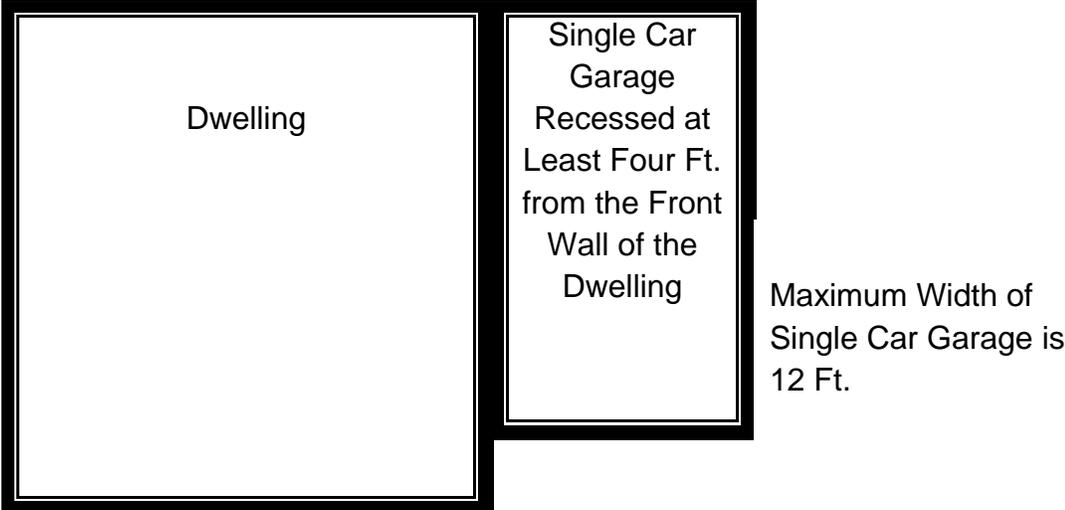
Single Car Garage Recessed from Front Wall of Dwelling
